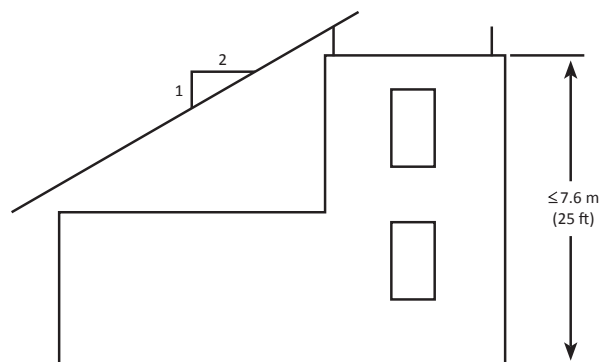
(a) Lower Roof Protection for Flat-Roof Buildings 7.6 m (25 ft) or Less in Height.
